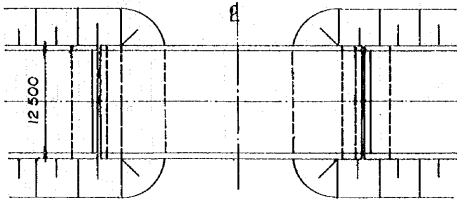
Typical Plan of PC Simple Girder Bridge
